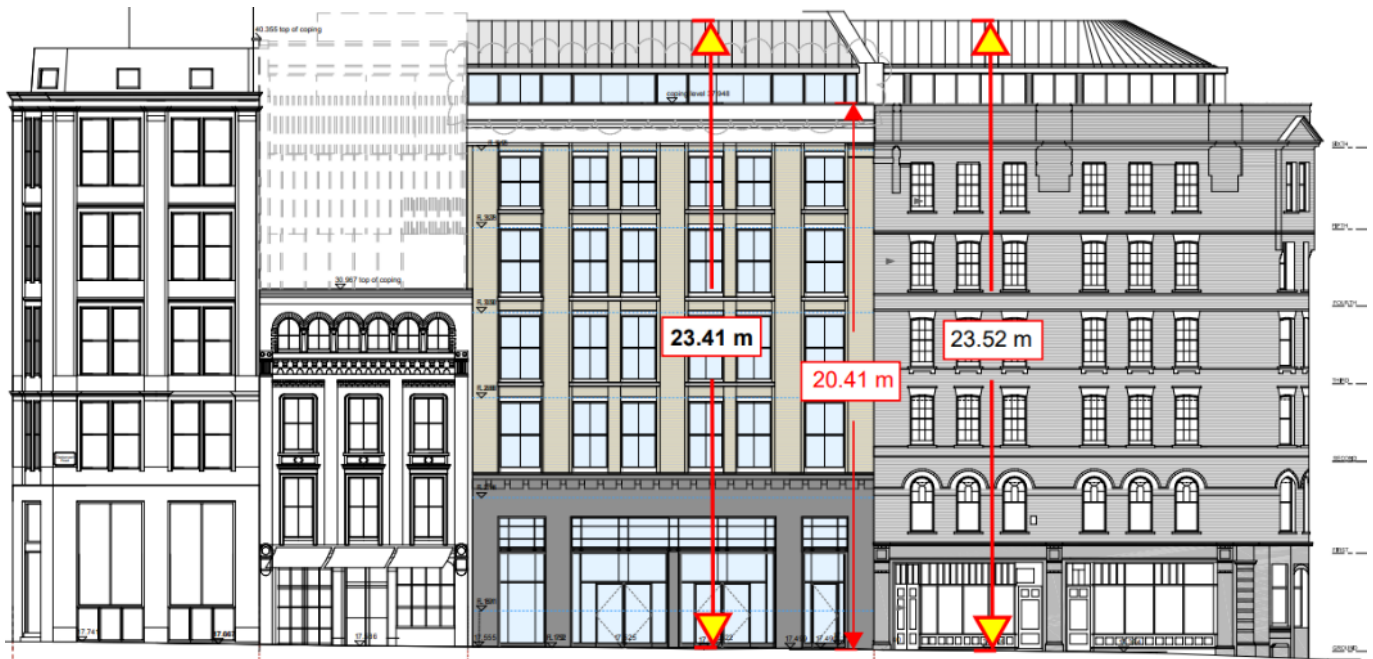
Proposed front elevation showing adjoining height of No's 33-35 St Johns Square.
